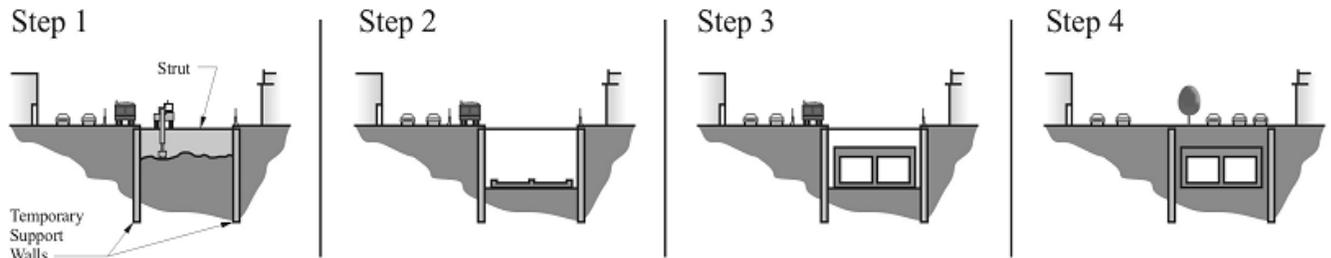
Cut-and-Cover Tunnel Bottom-Up Construction Sequence<sup>[2]</sup>
